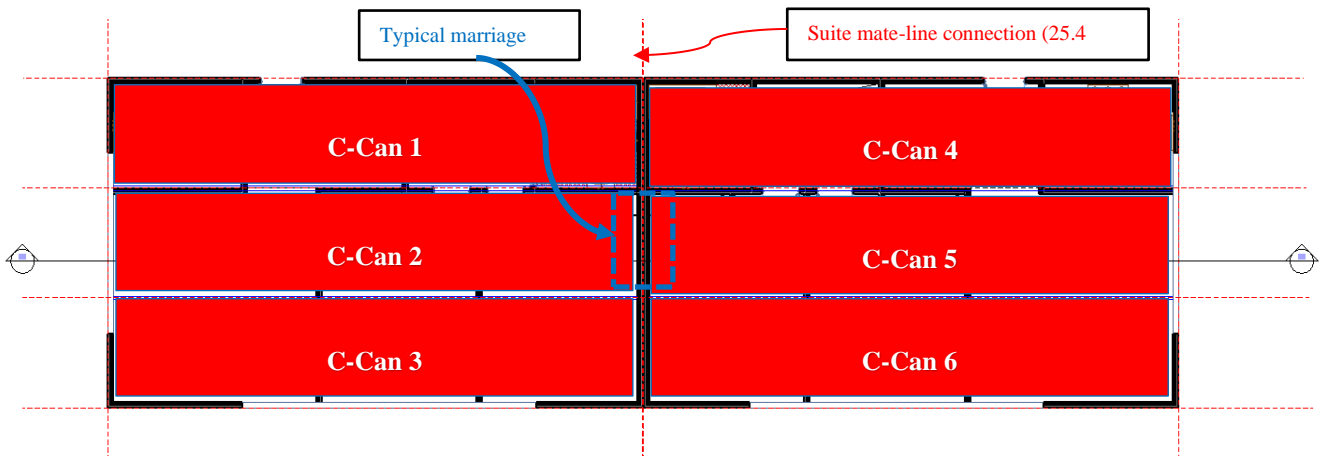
Typical Multi-unit Floor Plan showing C-can Layout and Modular Connection
